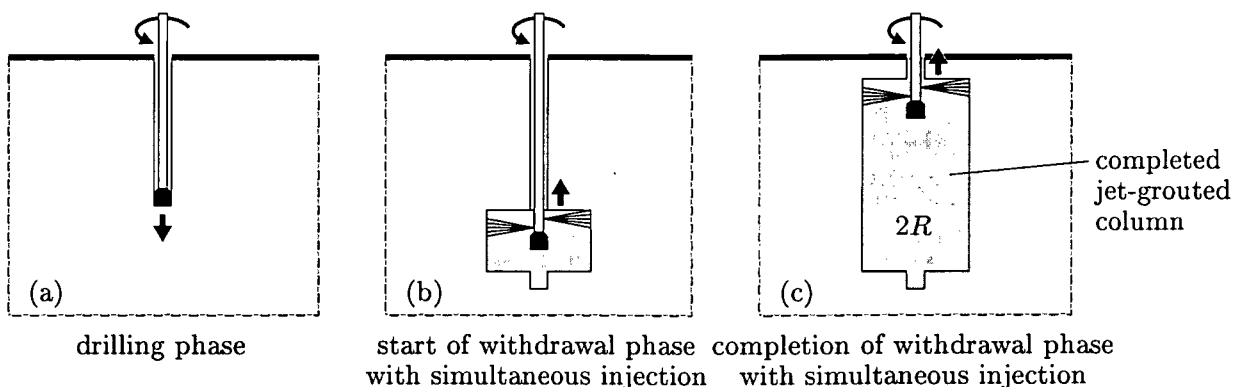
Construction sequence of jet grouting (Henn, 1996) (R : radius of jet-grouted column)
